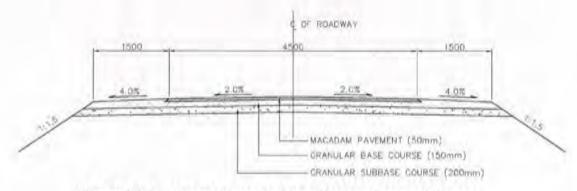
Typical Cross Section of Bridge Approach Roads
